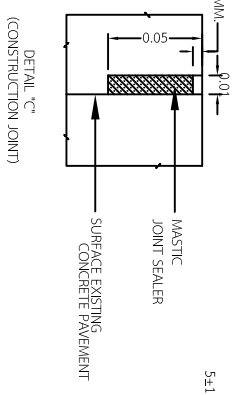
DETAIL OF JOINT BETWEEN NEW AND EXISTING CONCRETE PAVEMENT (TRANSVERSE JOINT)
